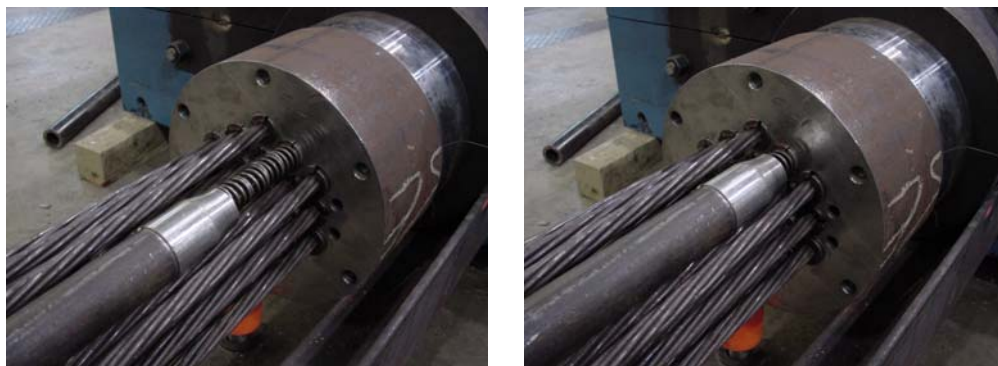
Stay Cable Specimen Installation (Steps 5 – 8)
